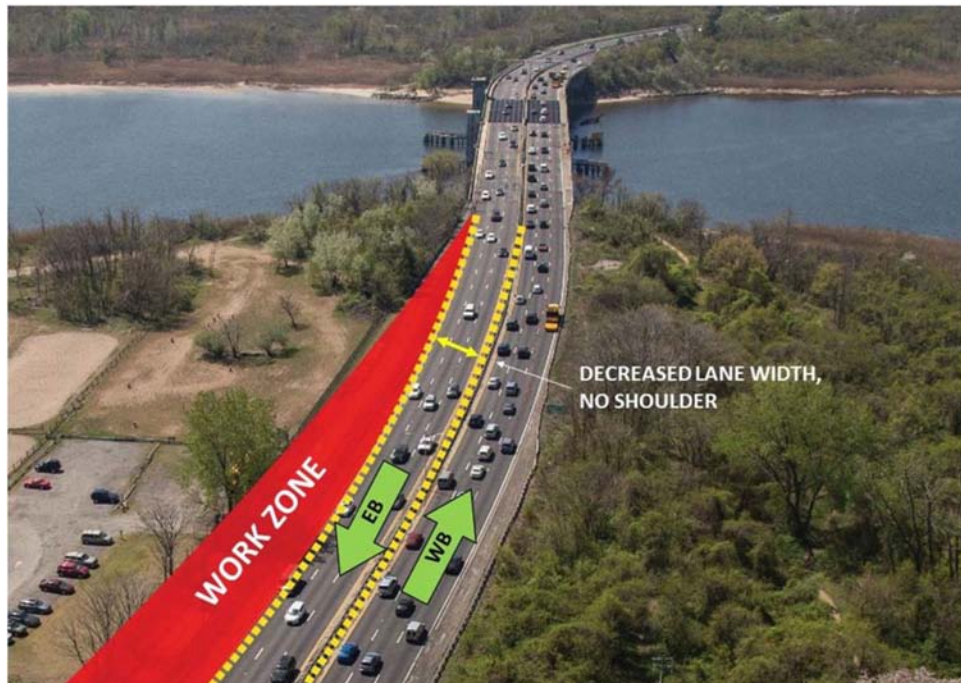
Preplanning work zone and construction site setup (Chin, 2015).
